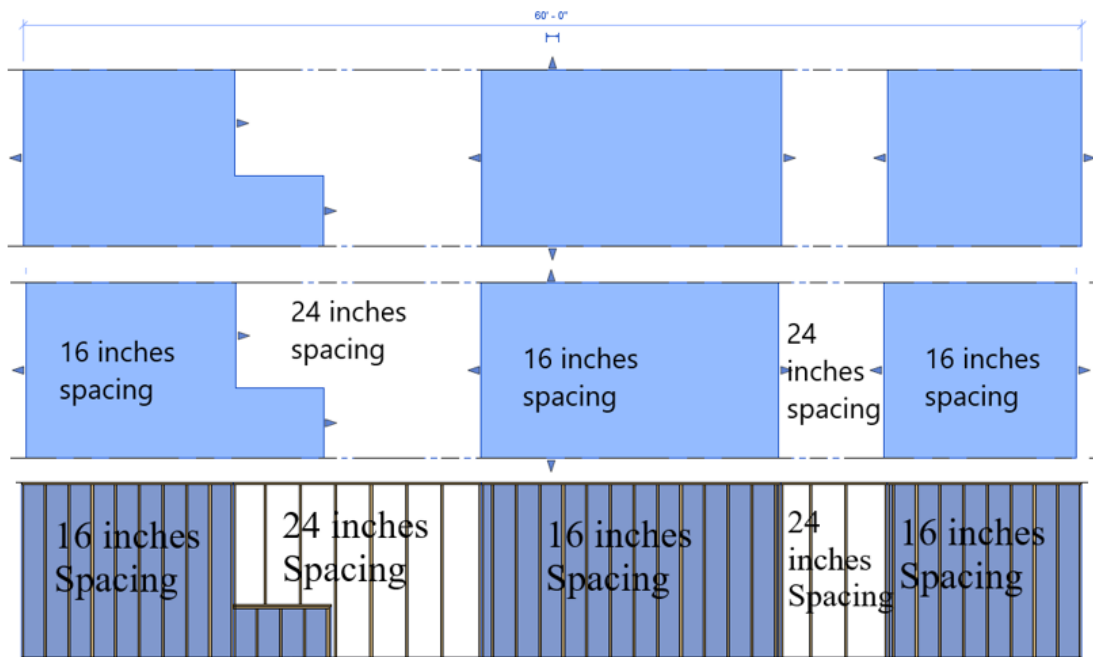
Stud Spacing on Multiple walls with shipping openings (Elevation view)
